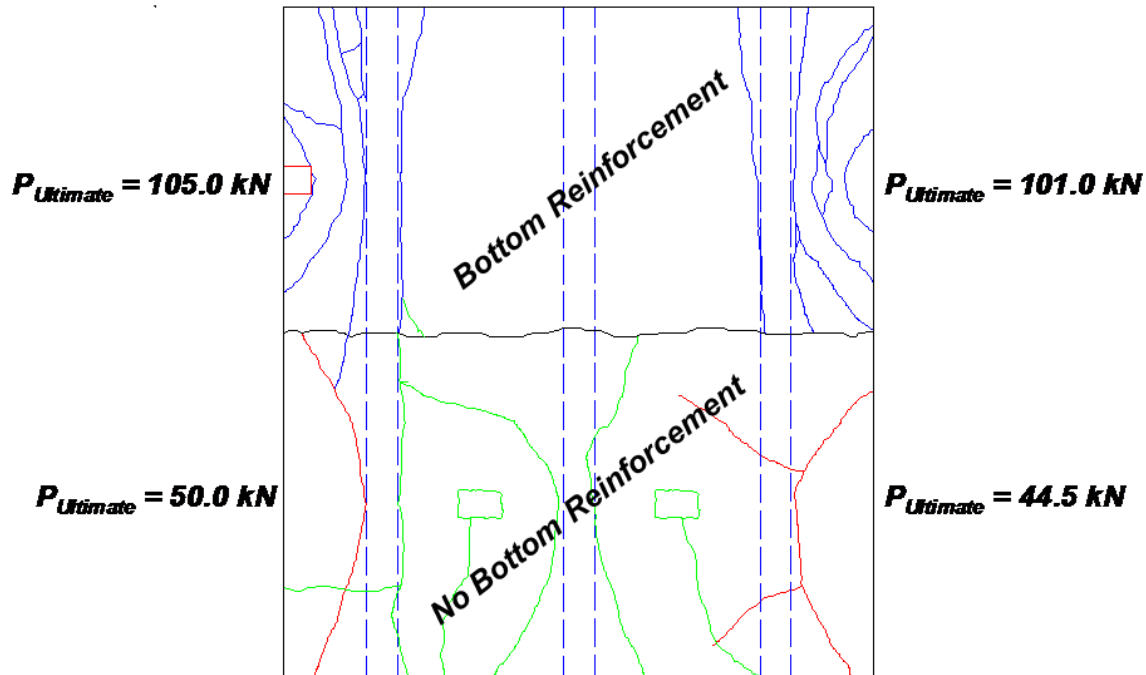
Crack patterns and failure loads for static cantilever tests (Gant & Newhook, 1999)
